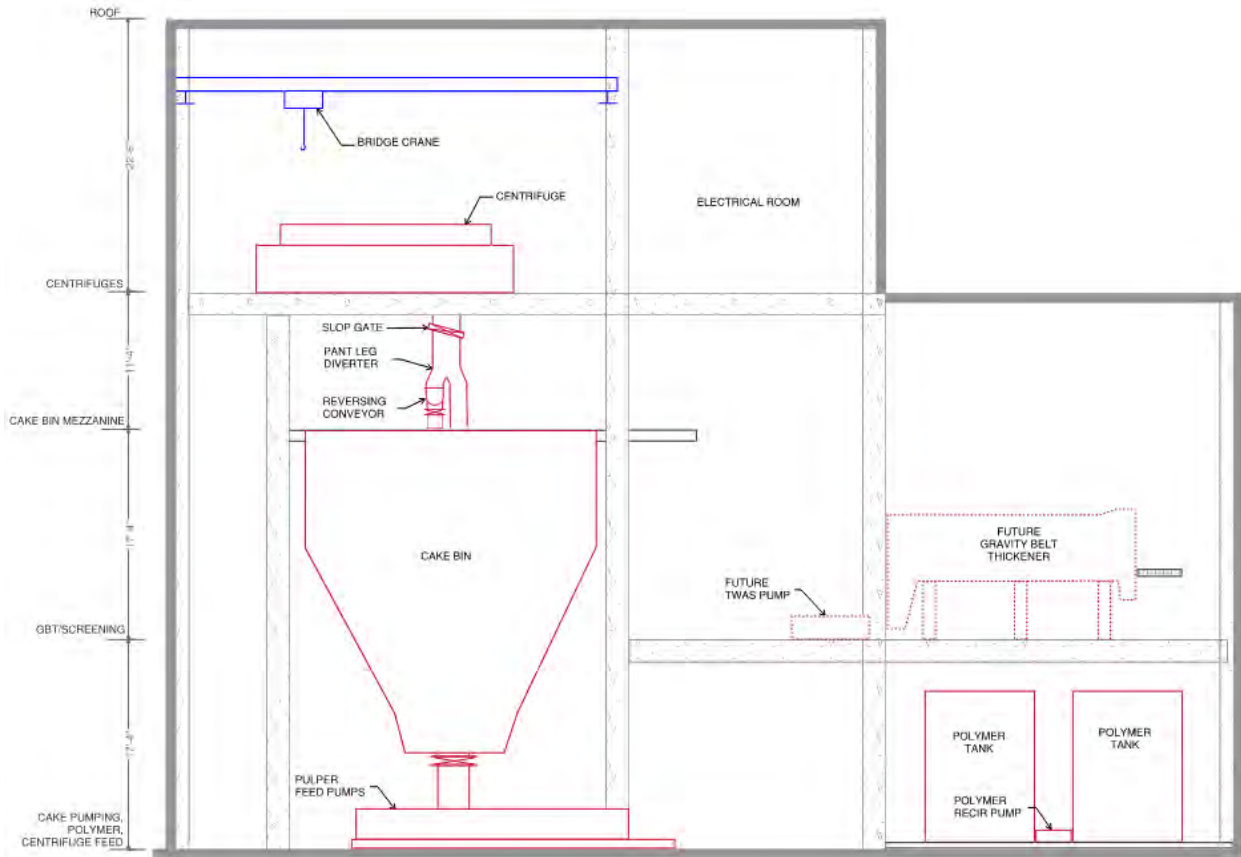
New Thickening/Screening/Dewatering Facility Section 2
